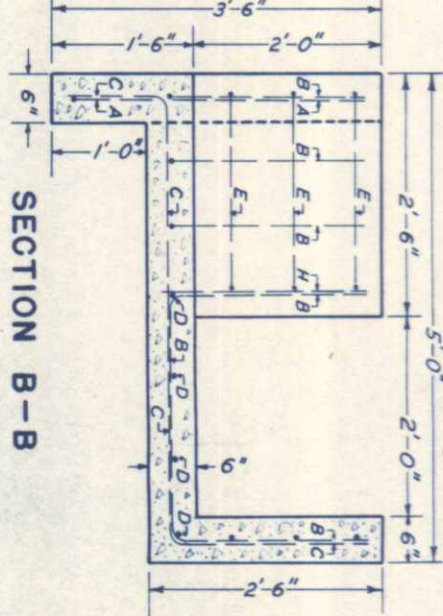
DETAILS OF CONCRETE DIVISION BOX STA. 95+84
